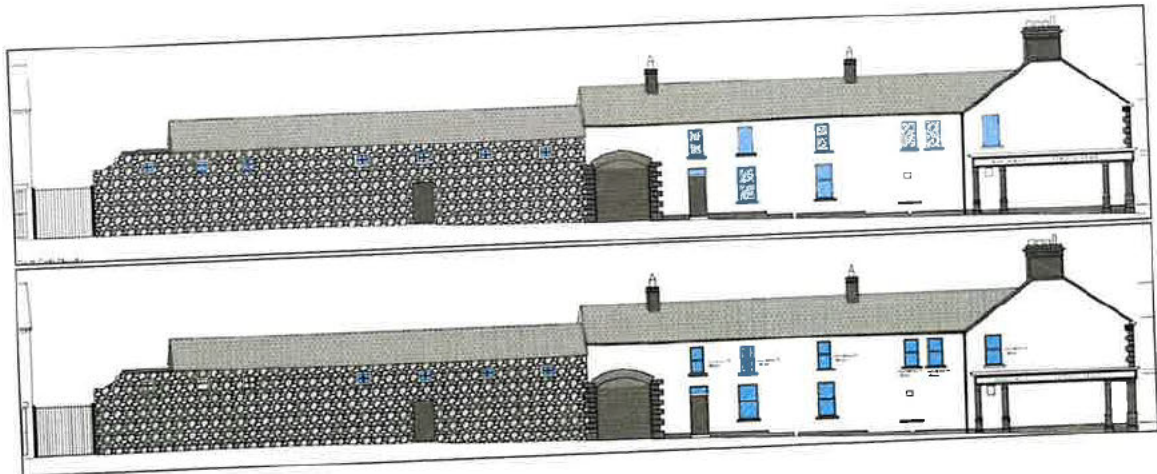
Existing (top) and proposed (bottom) southern elevations.
